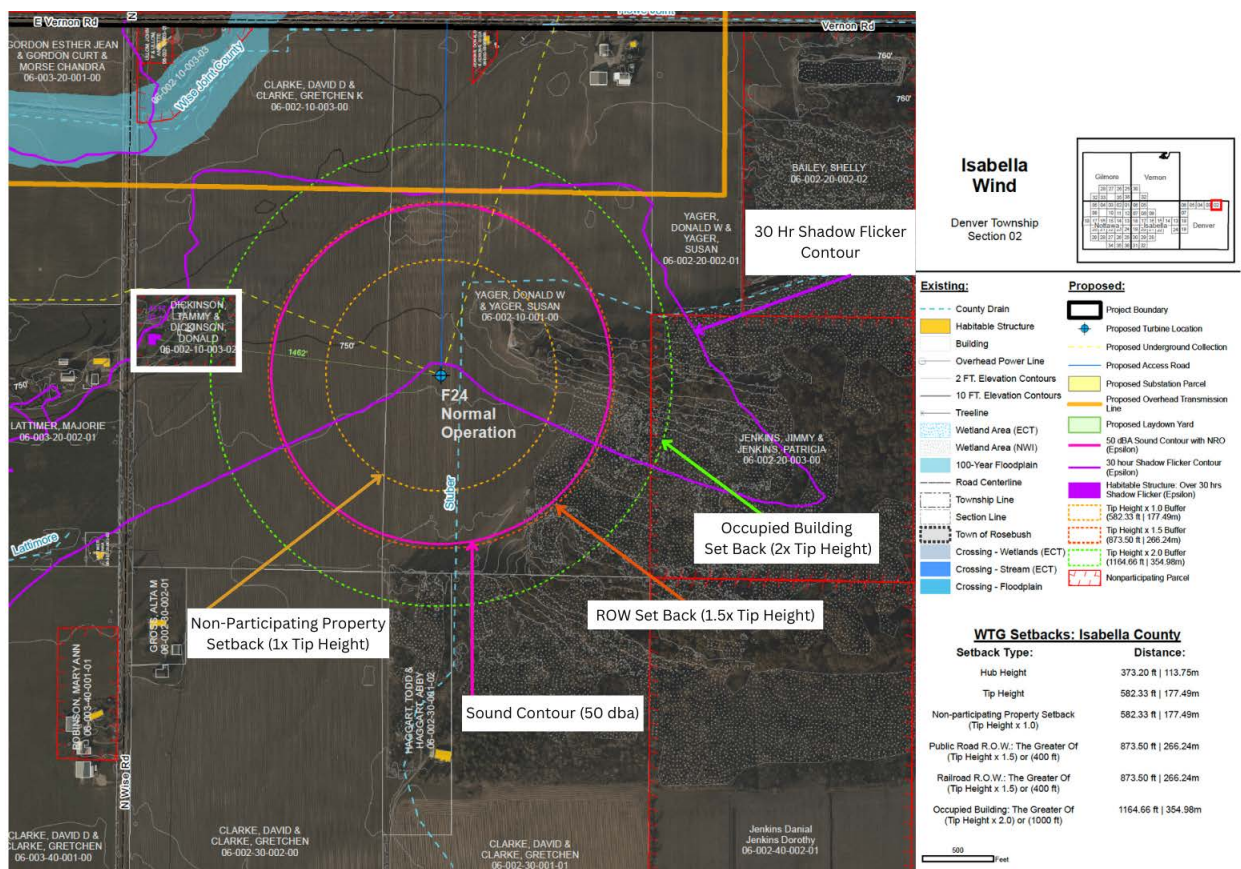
Isabella Wind Site Plan Example Section I [Subsection of Denver Township]
